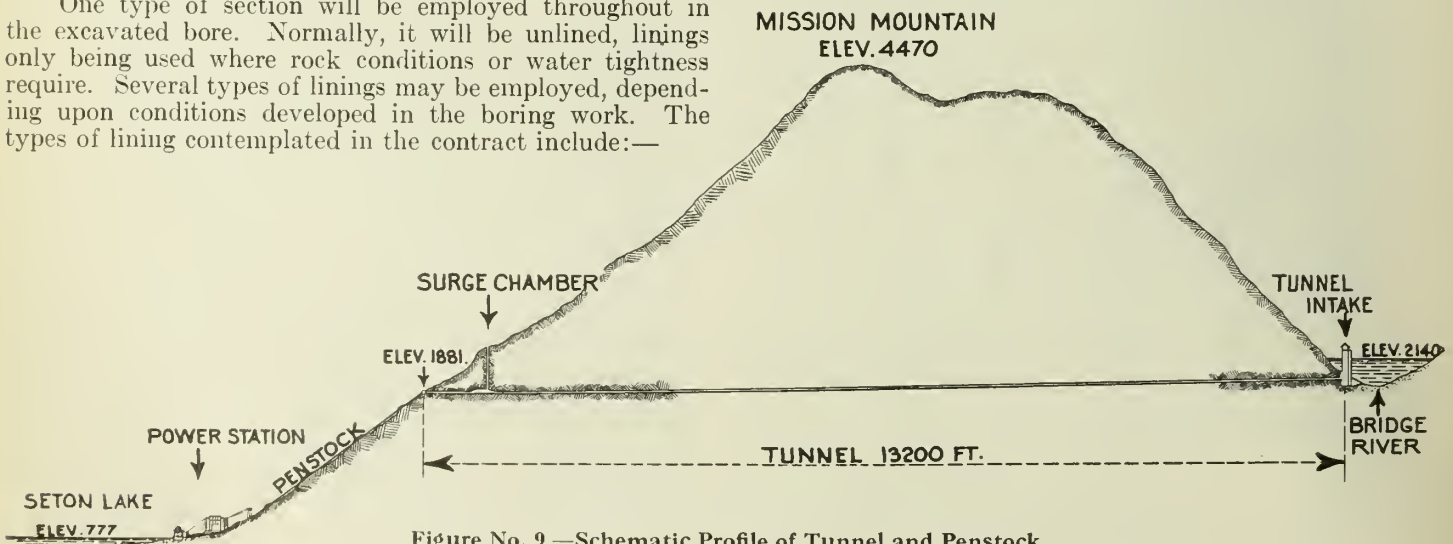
Schematic Profile of Tunnel and Penstock.
